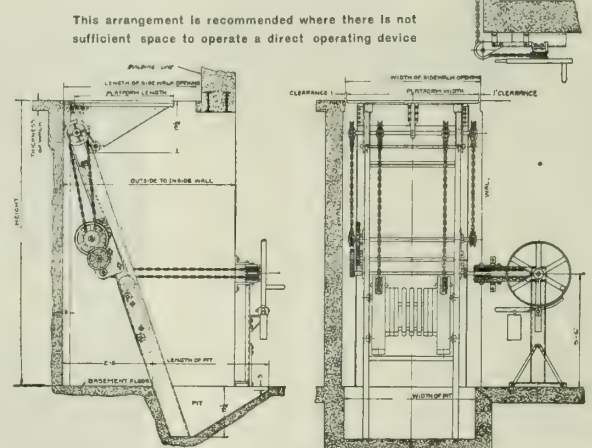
Shows Platform Lift with Right Angle Cranking Mechanism, Arranged in a Crowded Areaway with Walls on Three Sides
